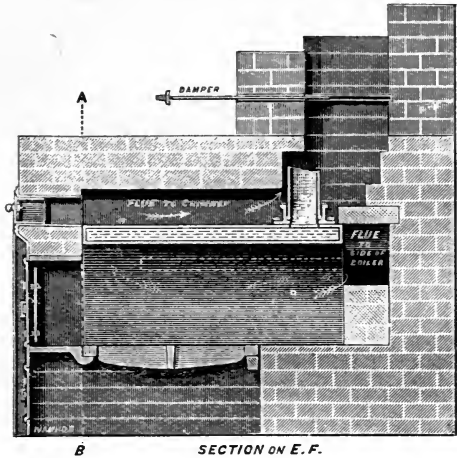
Setting of saddle boiler—Sectional elevation front to back.
